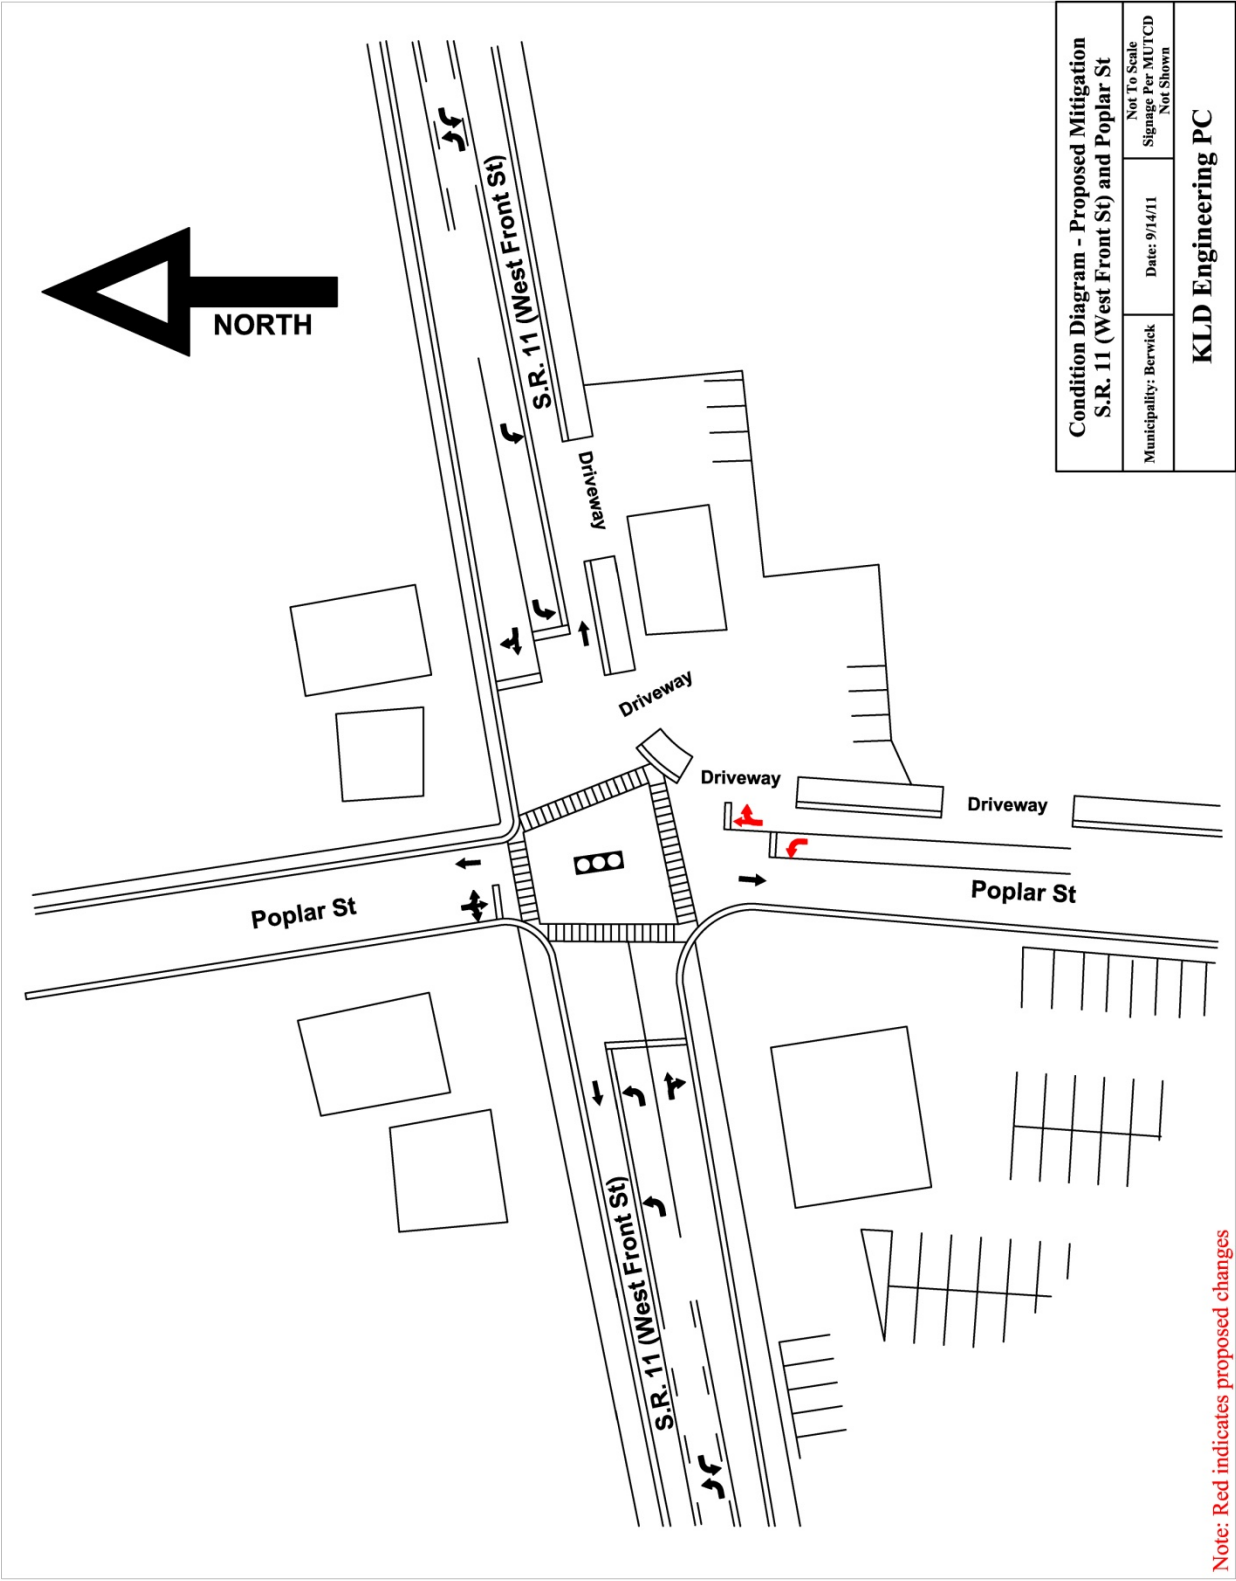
S.R. 11 (Front Street) and Poplar Street
